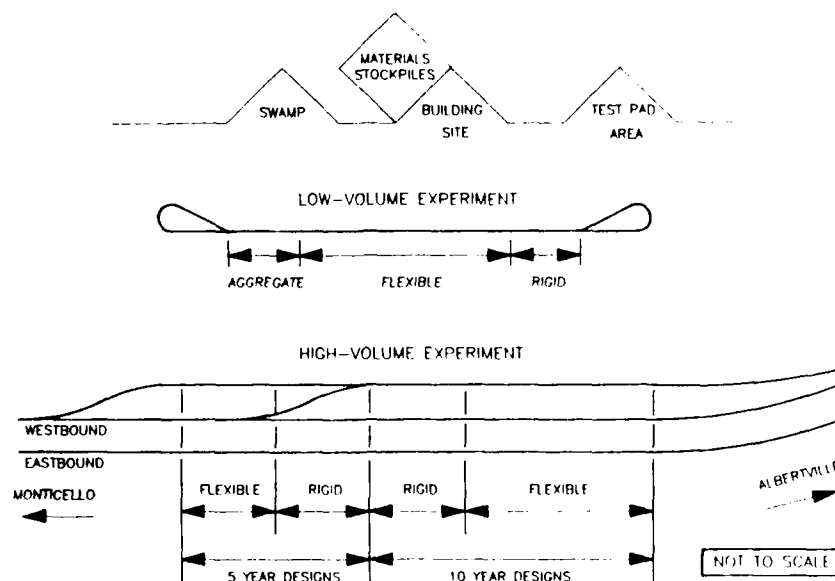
SCHEMATIC LAYOUT OF COLD REGIONS PAVEMENT RESEARCH TEST FACILITY
